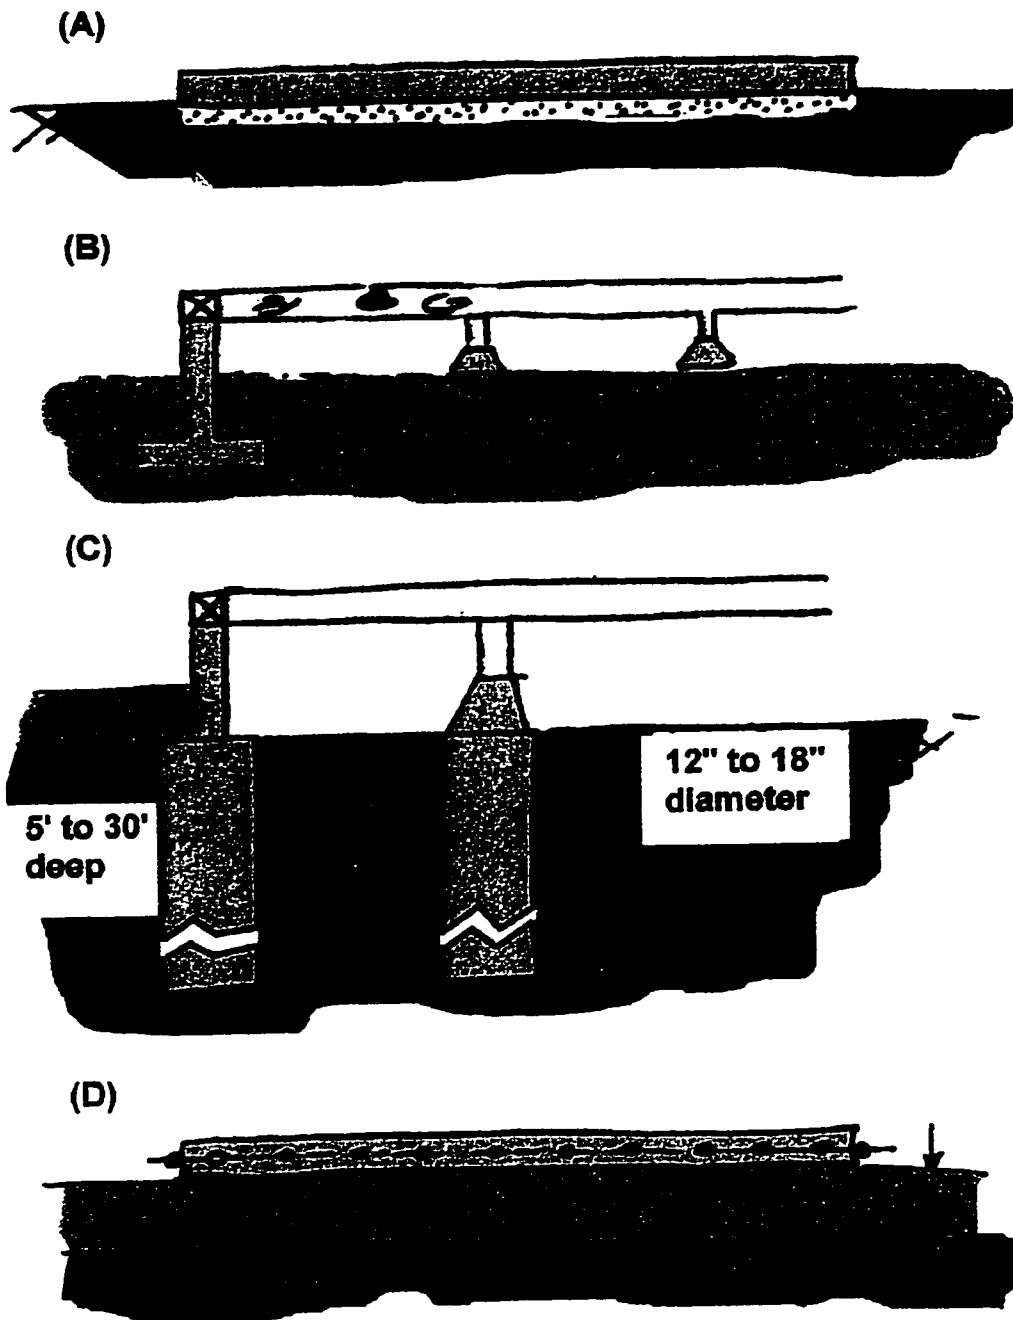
Evolution of residential foundations: (A) slab-on-grade with a capillary break, common before the 1960s; (B) spread footings with isolated interior footings, common in the 1960s and currently; (C) pier and grade beam, meant to anchor the foundation below an unstable zone and used commonly since the 1970s; (D) post-tensioned slab, designed to act as a unit in an unstable zone and the current foundation of choice in new developments.
